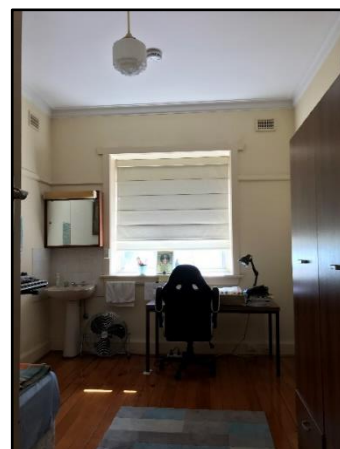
Internal view of bedrooms on the first floor showing timber flooring and later addition plastered ceiling.
